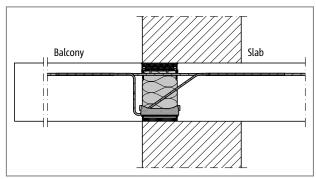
Schöck Isokorb® XT type K: Connection with single-leaf masonry
